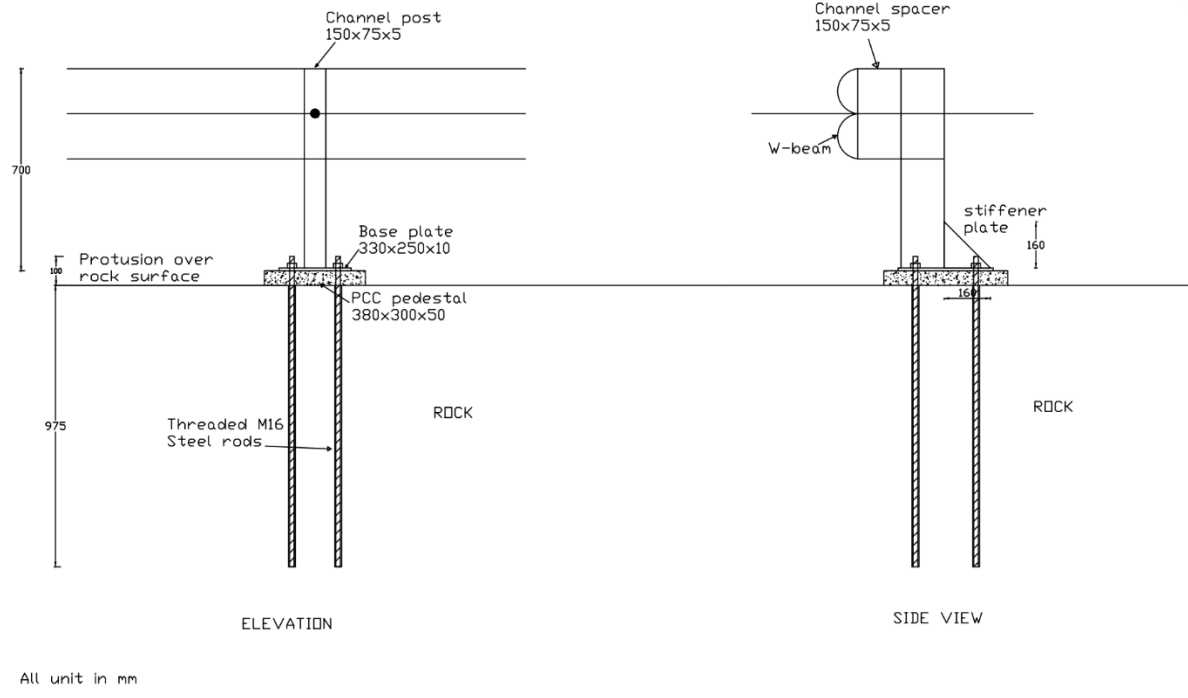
Elevation and side view of crash barrier installation in rocky stretch
